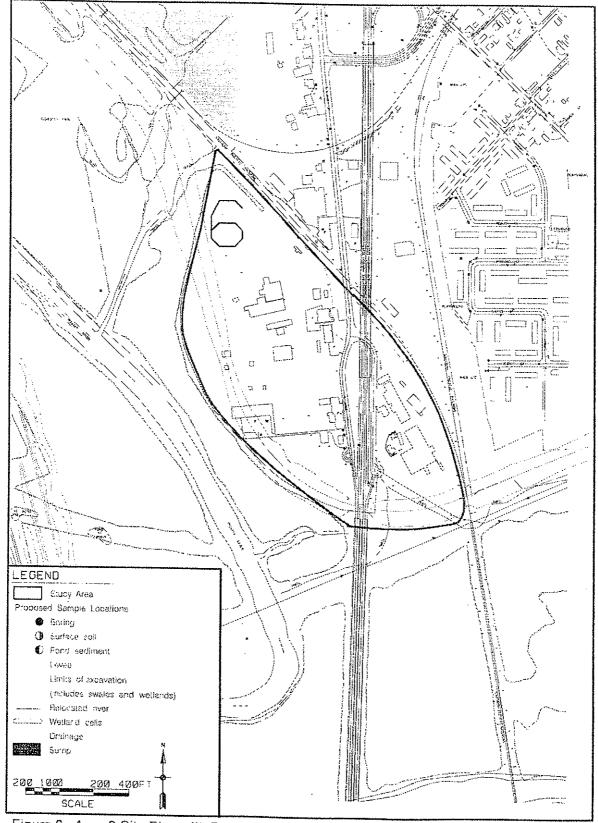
Area 6 Site Plan with Proposed Sampling Location and Construction Elements.
